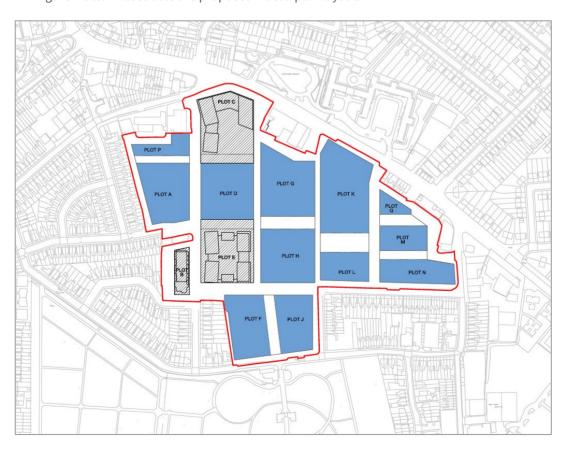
Proposed Masterplan Layout - Patel Taylor (October 2020)
